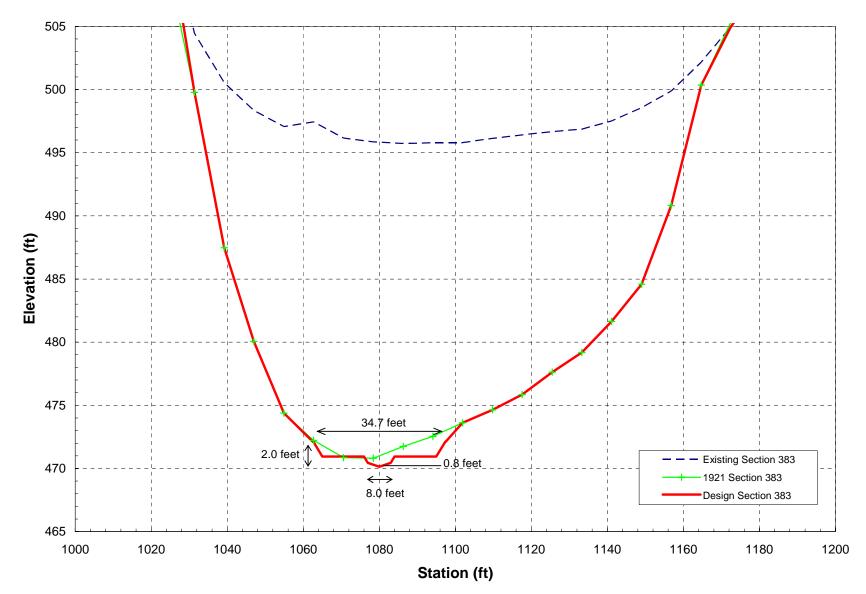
Typical cross section and design channel geometry for the reconstructed reach of the San Clemente Creek Branch under the Complete Dam Removal Alternative.
